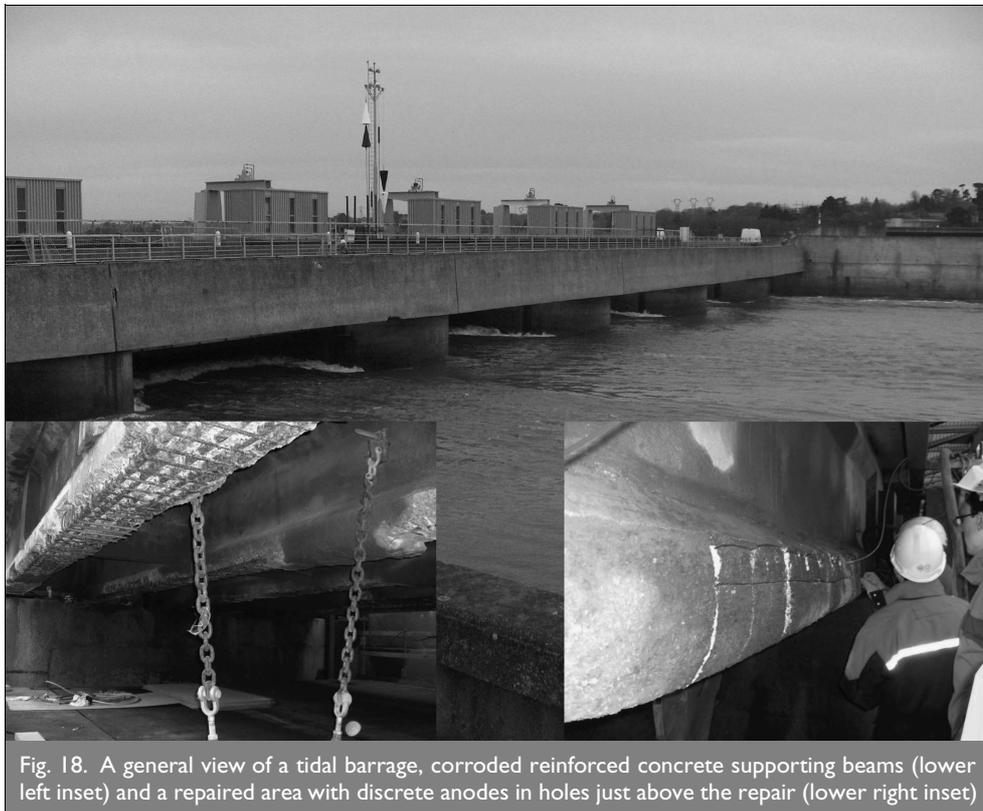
A general view of a tidal barrage, corroded reinforced concrete supporting beams (lower left inset) and a repaired area with discrete anodes in holes just above the repair (lower right inset)
